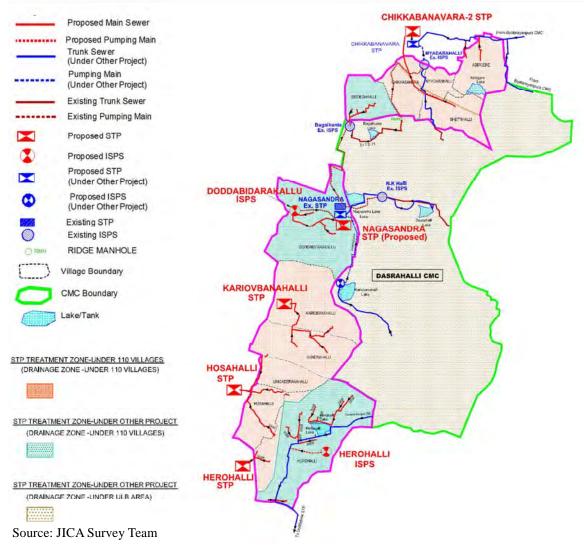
Layout Plan of Main Sewer Lines in Dasarahalli Zone
